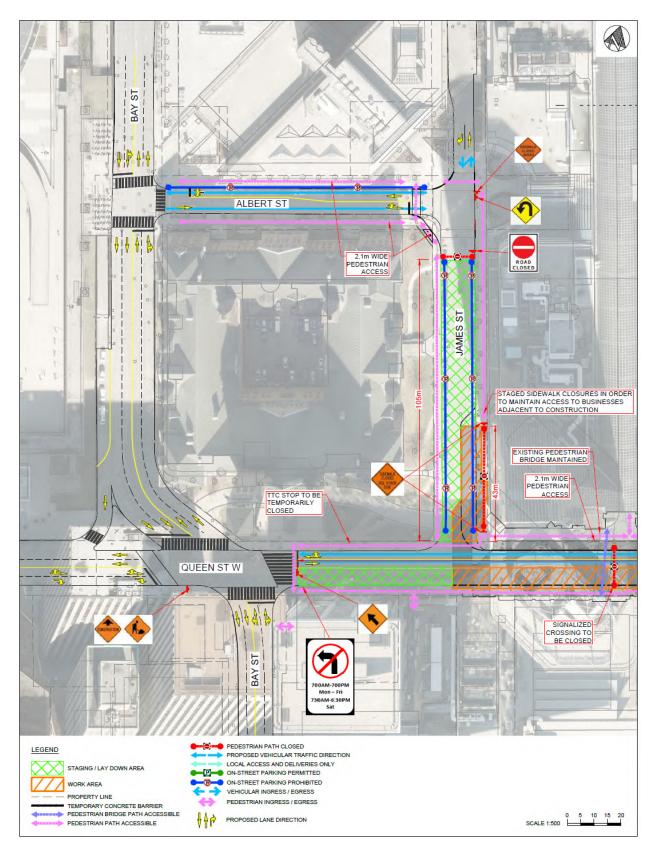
Partial Queen Street Closure (South Construction) - Traffic Staging Plan
